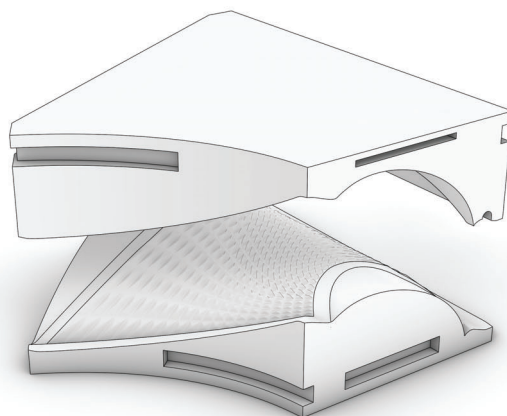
Schematic drawing of double-sided 3DP formwork with interlocking details.
